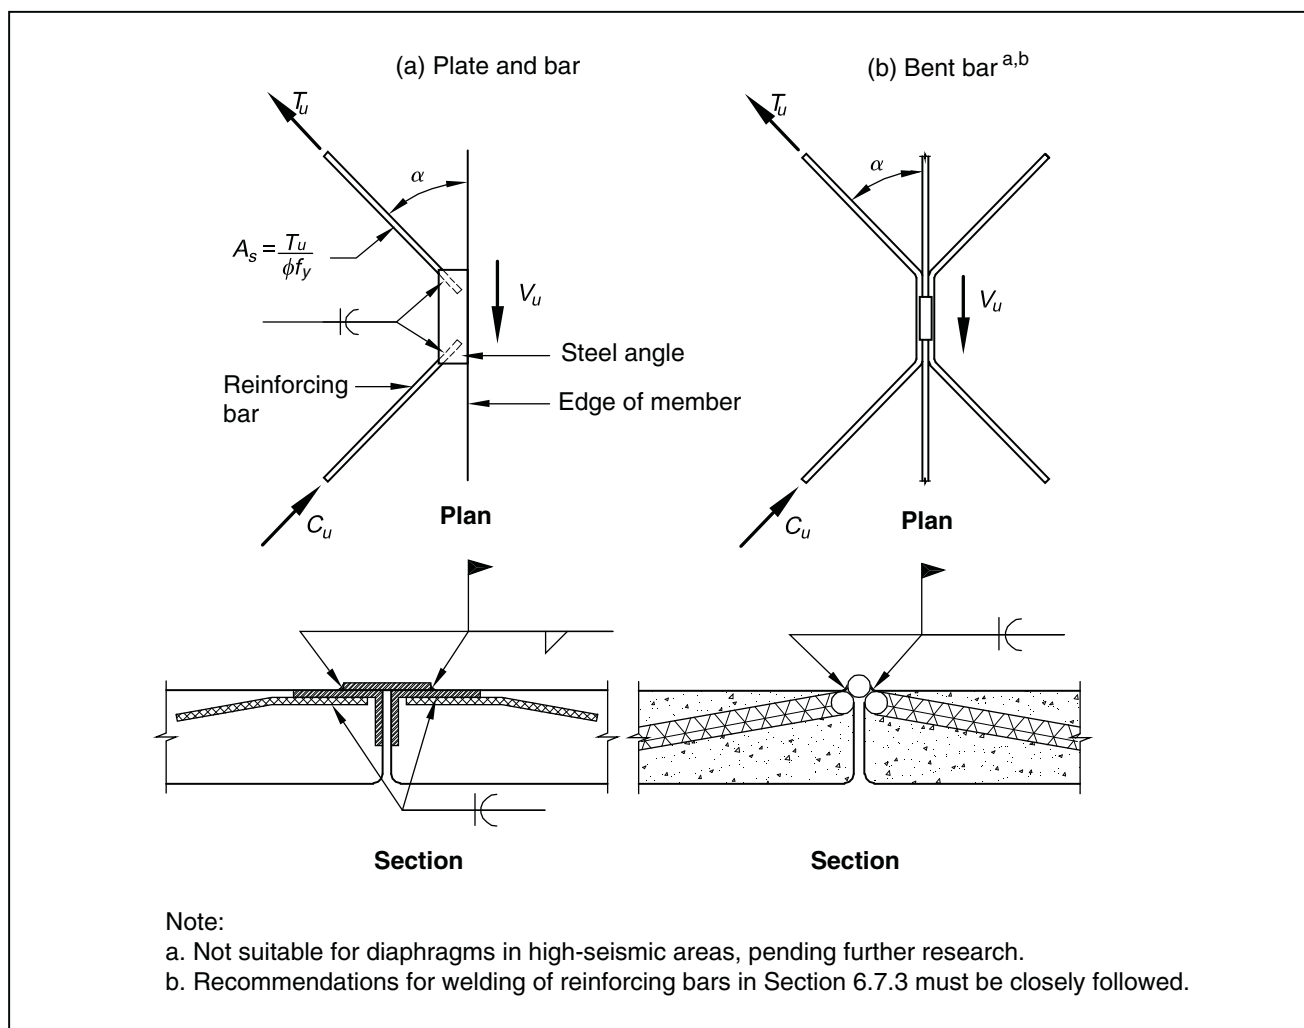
Typical flange weld plate details. See Chapter 6 of this handbook for design of welds and connections.
